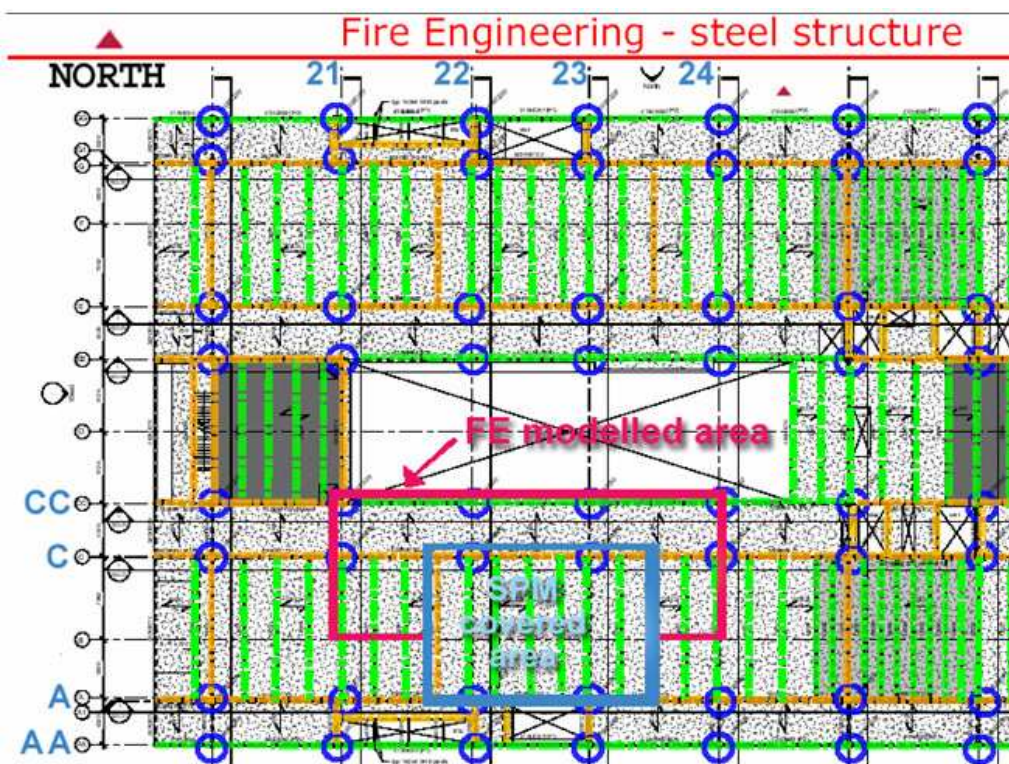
Typical floor plan shows the fire engineering design and the part of the building analysed by FEA
